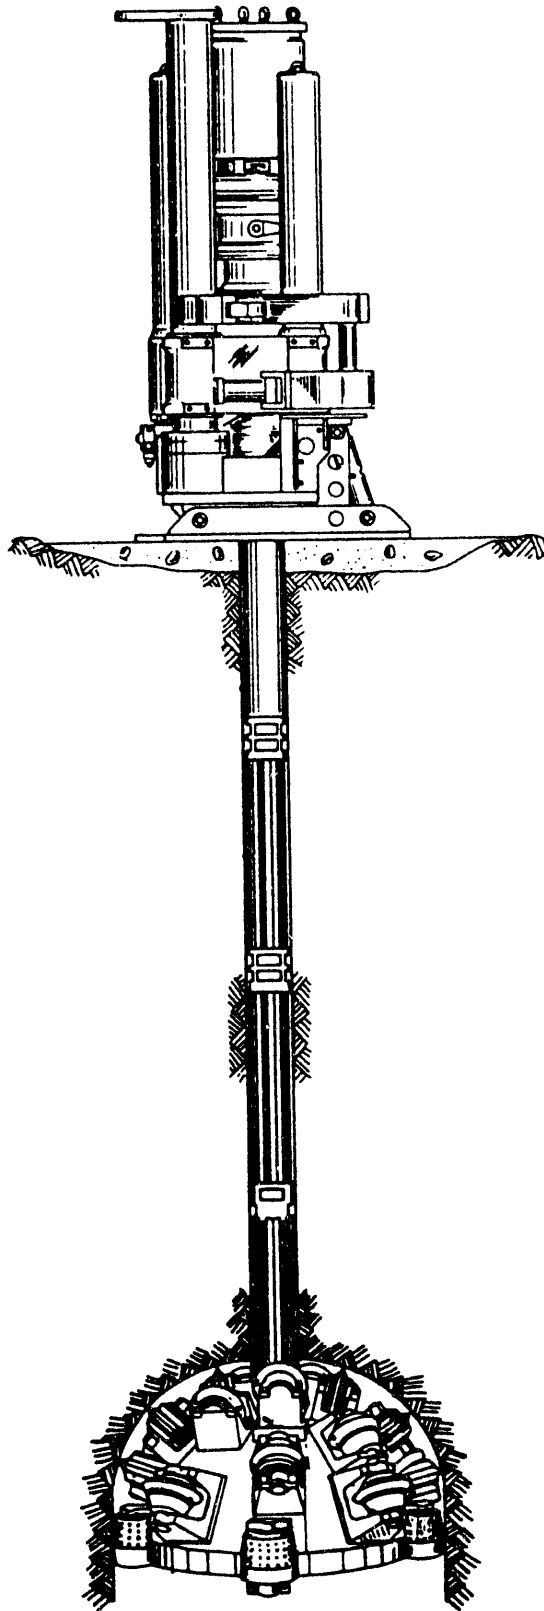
Schematic Drawing of a Raise Drill With a Domed Reamer Head,
